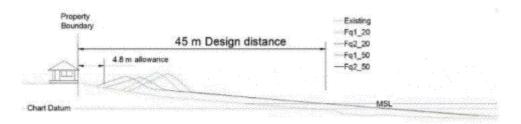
Design gravel barrier used to inform modelling and engineering design (Beya and Asmat, 2019).
